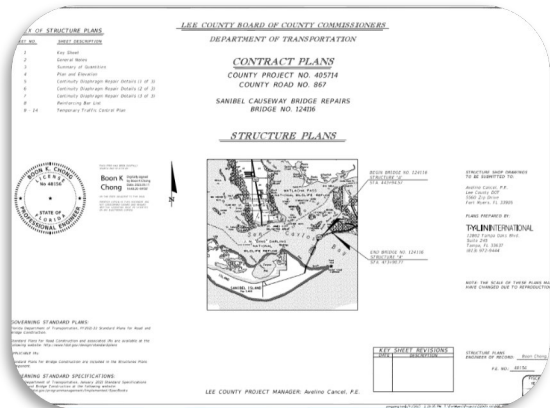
Sanibel Bridge – Continuity Diaphragm Repair Plans
